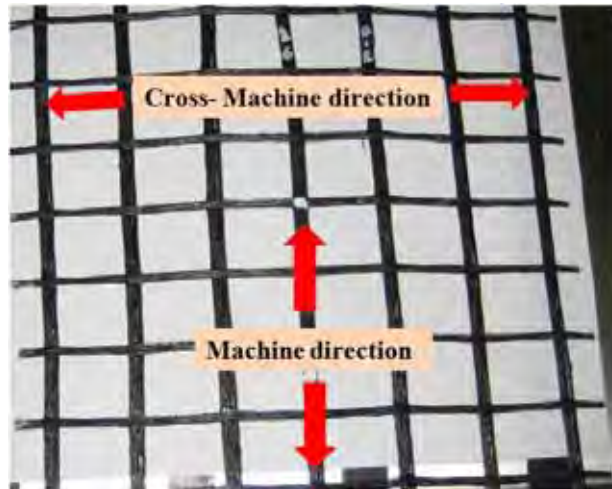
Geogrid G2 with machine and cross-machine direction
